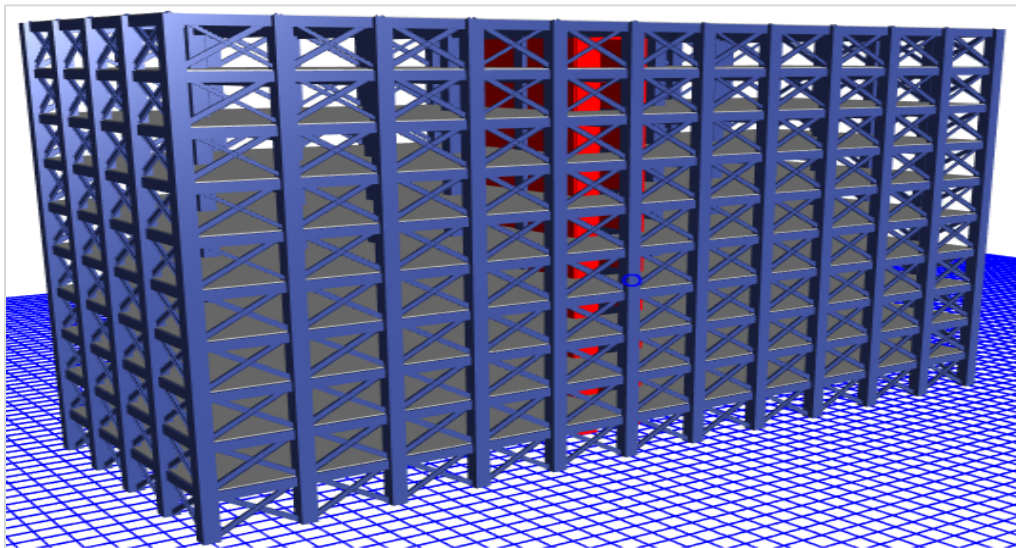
3D View of structural skeleton of framed tube structure with X bracings
